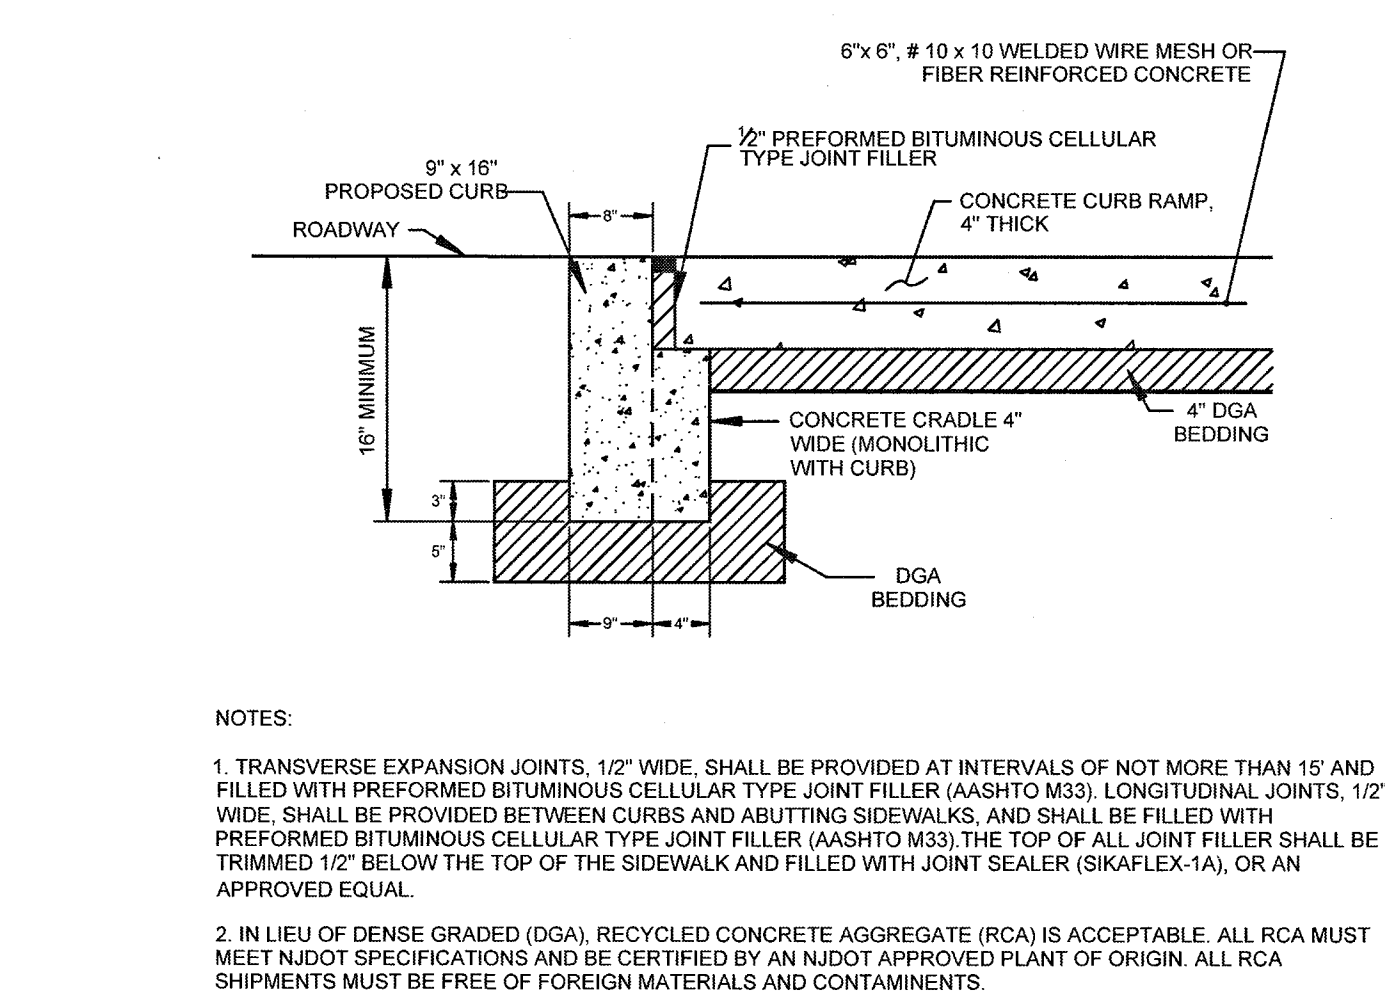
STANDARD GRAY CONCRETE VERTICAL CURB DETAIL
